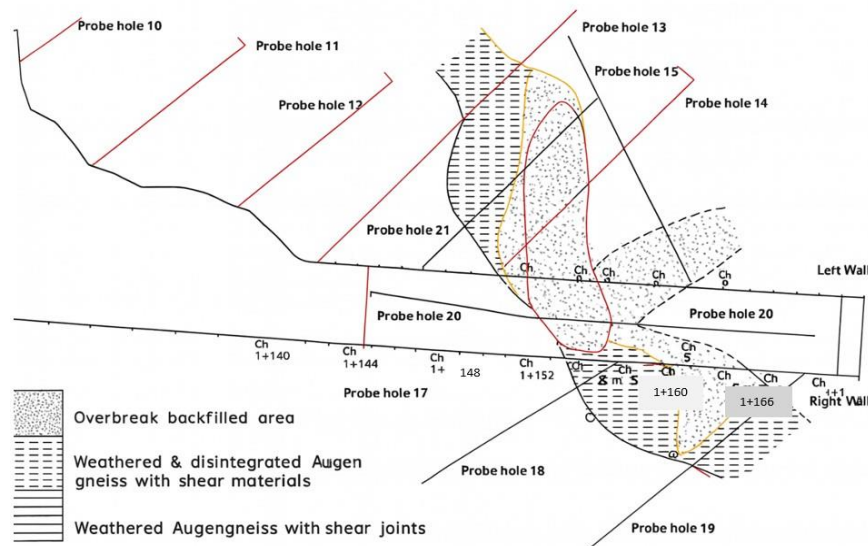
Geology of the collapsed section (HRT plan view after probe drilling)
